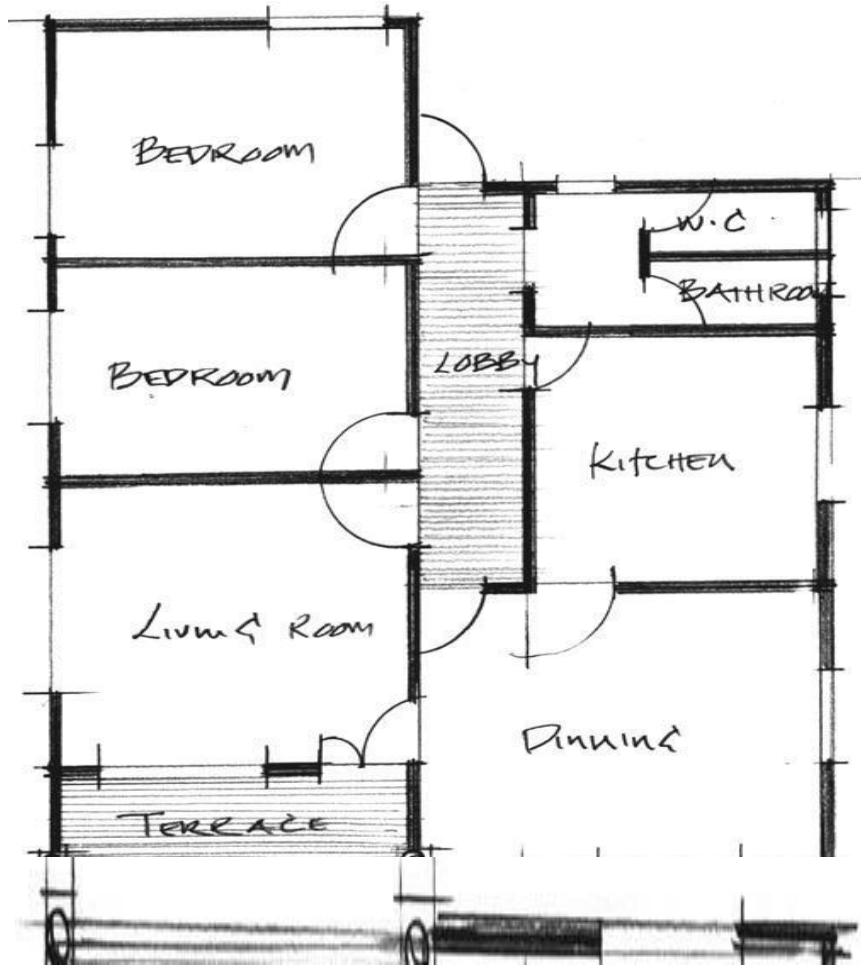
Floor Plan of a typical detached duplex and villa house-types
